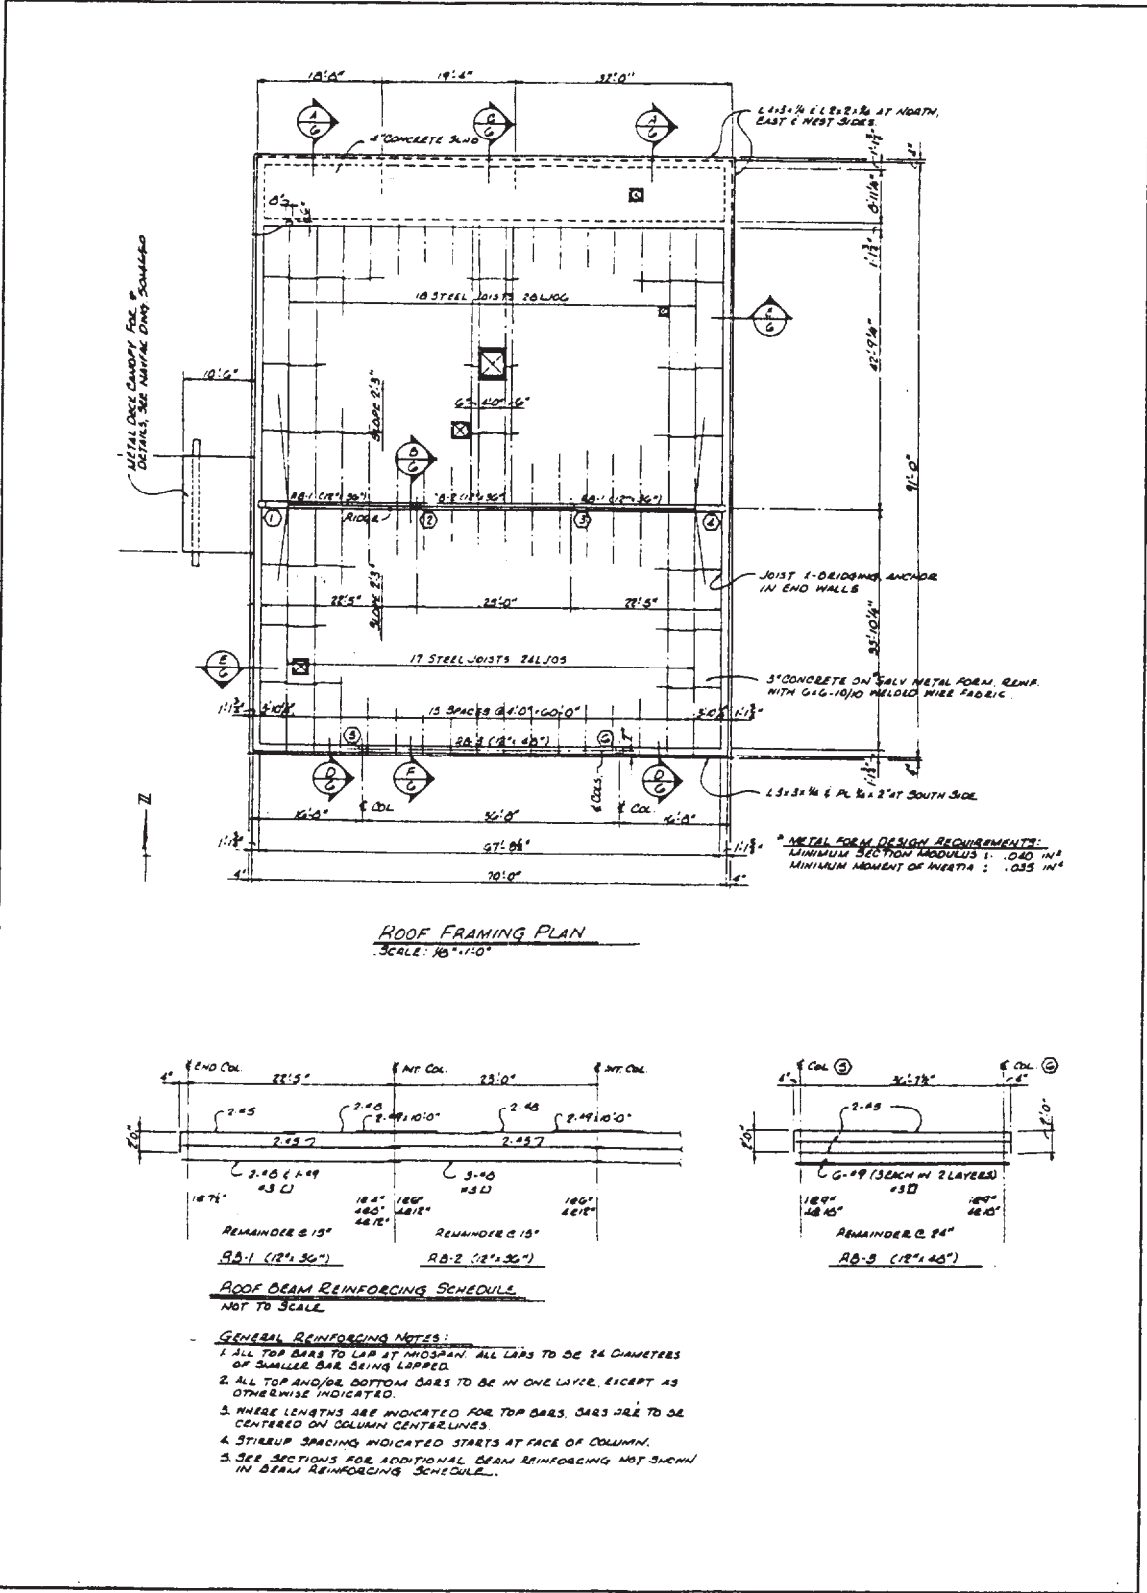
Example of a structural roof framing plan for a precast or a cast-in-place concrete construction.
